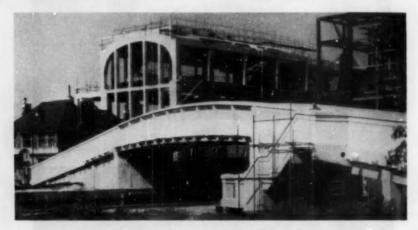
Prestressed Bridge. Turbine House in Background.
